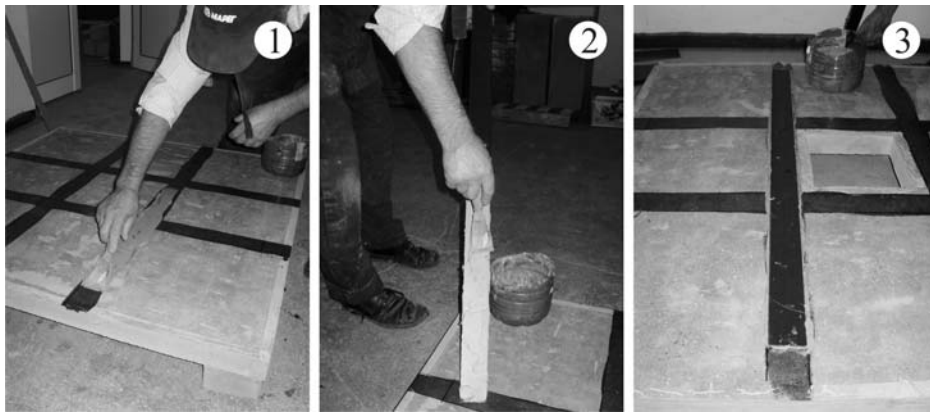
Applying the CFRP reinforcement strips: 1 – applying the adhesive on the RC slab; 2 – applying adhesive on the CFRP strip; 3 – applying the CFRP strip on the RC slab.
